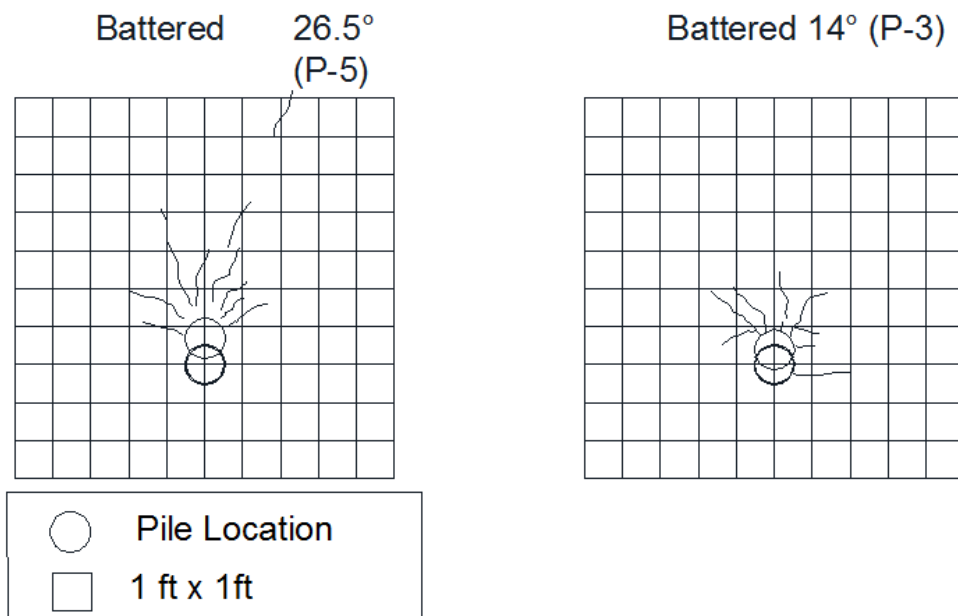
Cracking patterns for the +26° and +14° battered test piles
